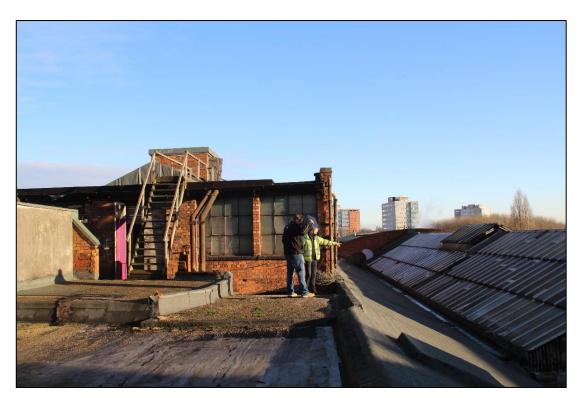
View looking east to the roofscape of Buildings 3 and 5
